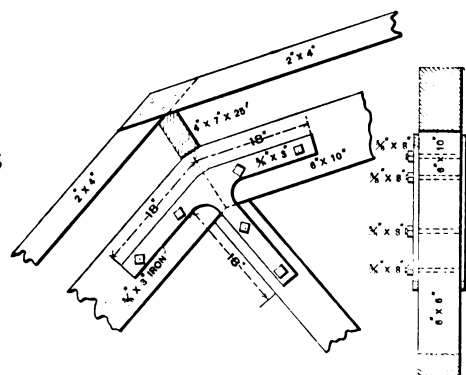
Details at B of Fig. 1.—Scale, 1/4 Inch to the Foot.
